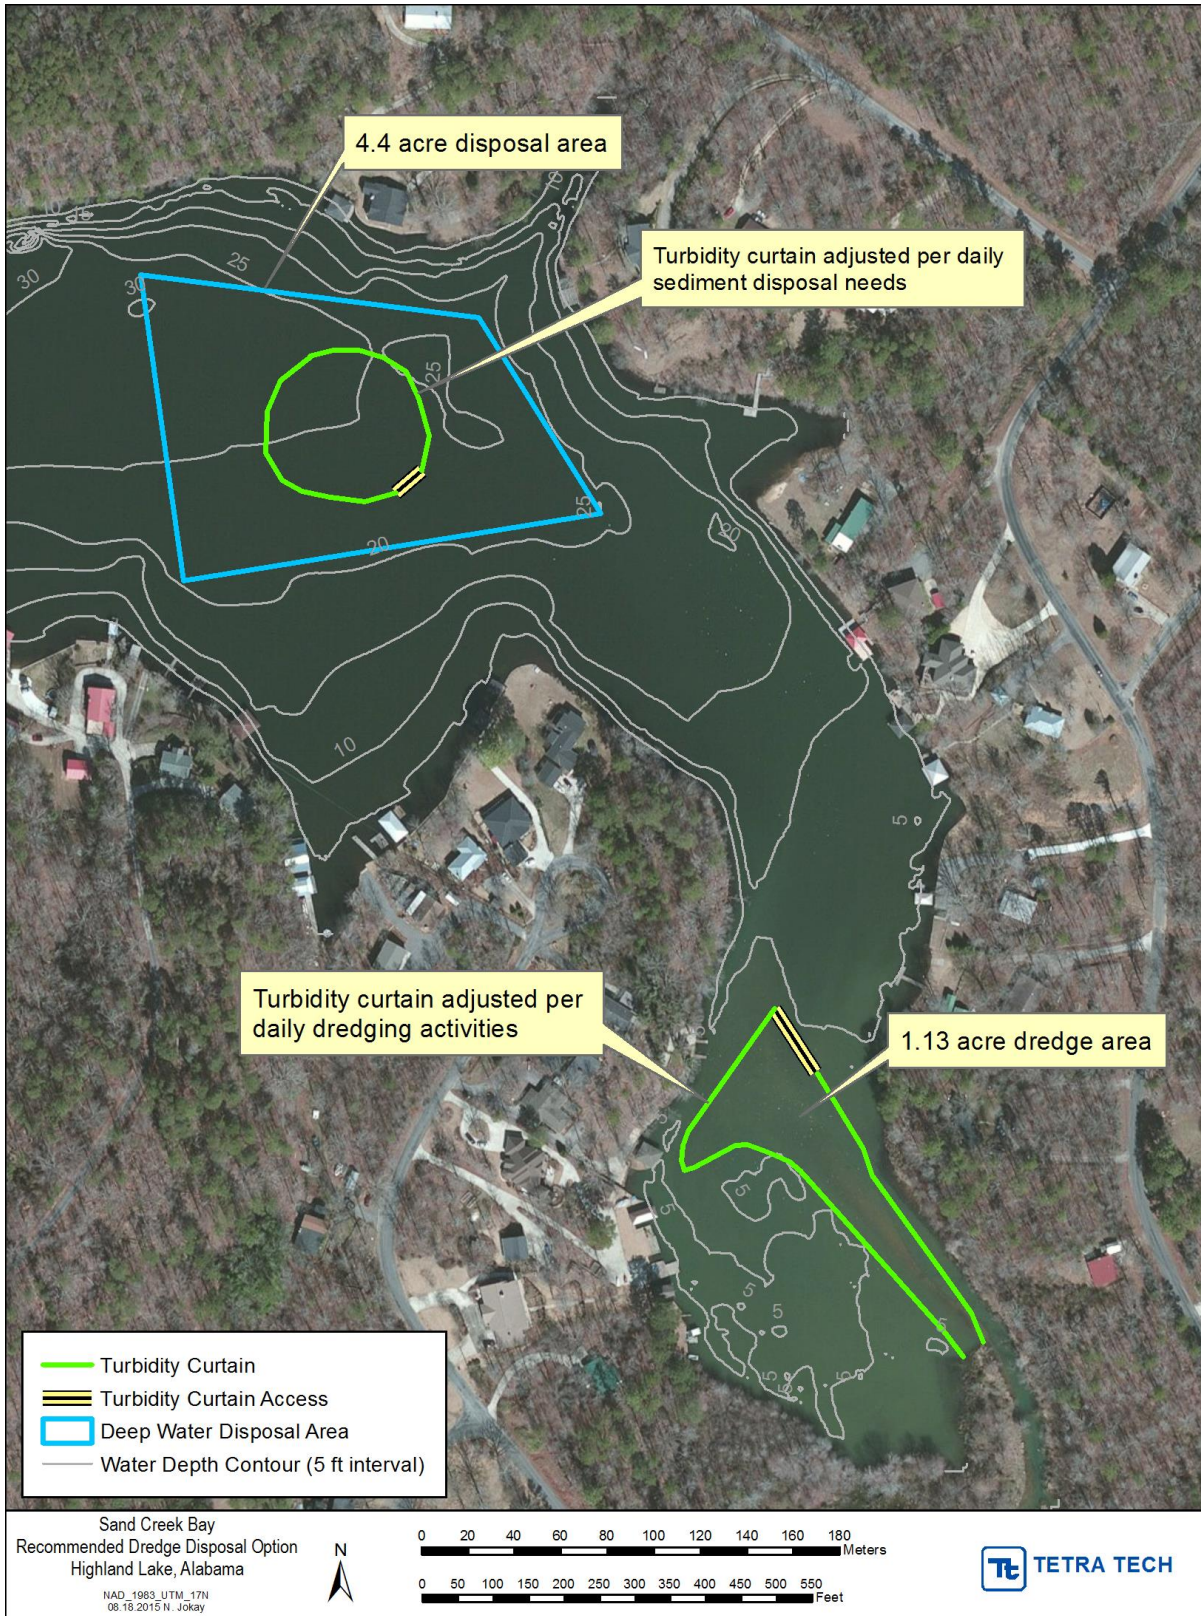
Recommended dredging and disposal plan- Sand Creek Bay detail
